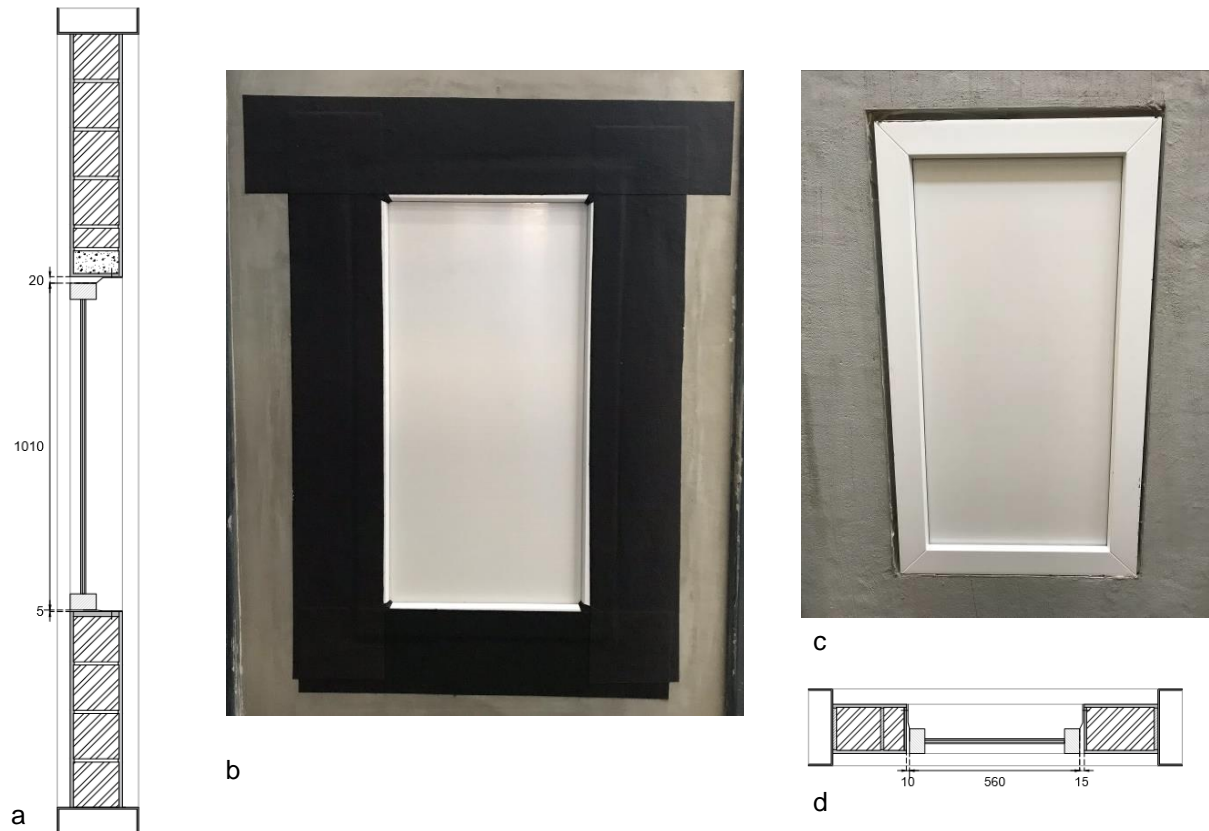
Test setup, a. vertical cross-section, b. exterior side of wall, c. interior side of wall, d. horizontal cross section
